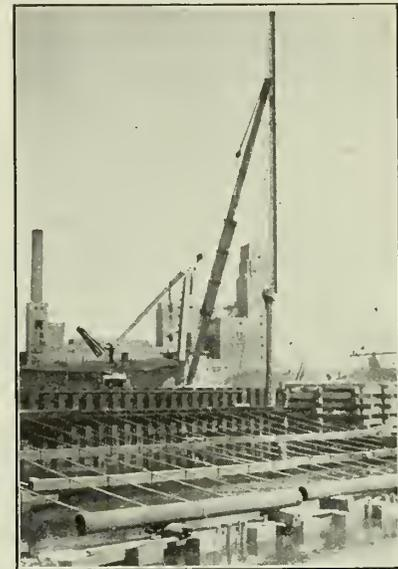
Interlocking Last Sheet Pile. Length of Pile 60 feet.
